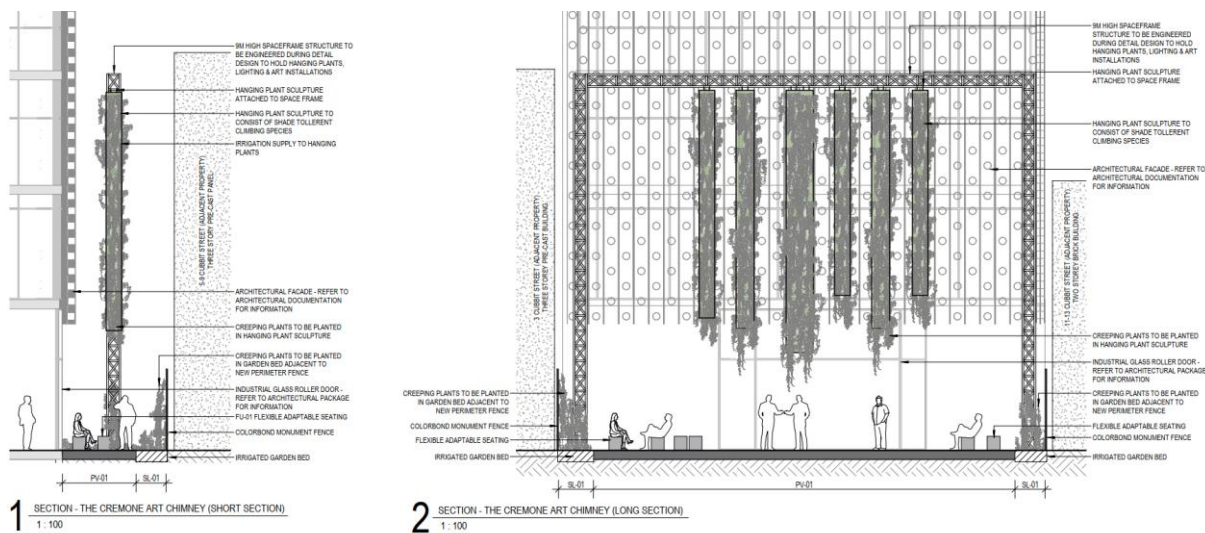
Cremorne Art Chimney concept plans (source: Landscape Plans)
